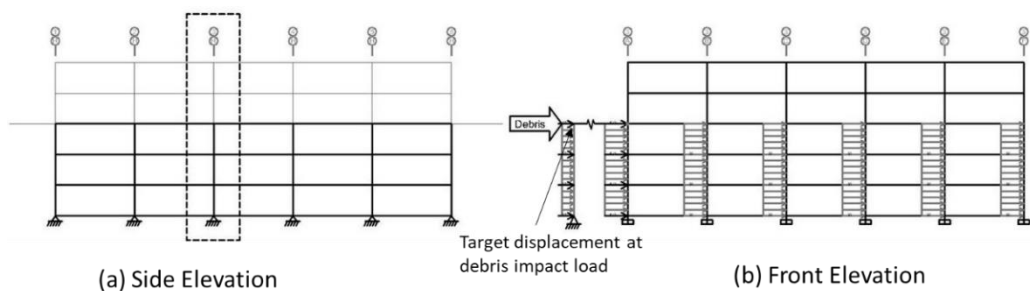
Application of tsunami forces on building with fender system (a) side elevation and (b) front elevation
